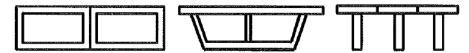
Reinforced Concrete / Pre-stressed Concrete Girders
